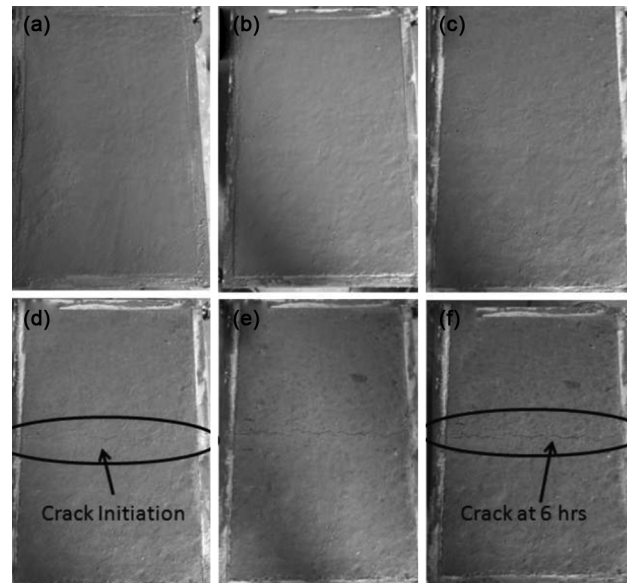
Crack formation in river sand mixtures at (a) 0 hour, (b) 30 minutes, (c) 60 minutes, (d) 150 minutes, (e) 240 minutes, and (f) 360 minutes
